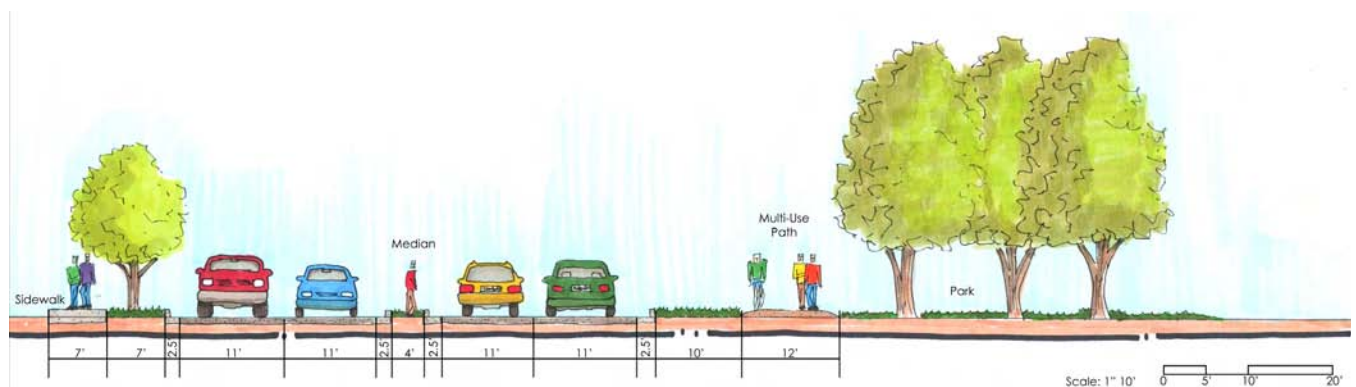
Possible cross-section for Atlanta Street between Azalea / Riverside Drive and the Allenbrook Roundabout (Alternative 1)
